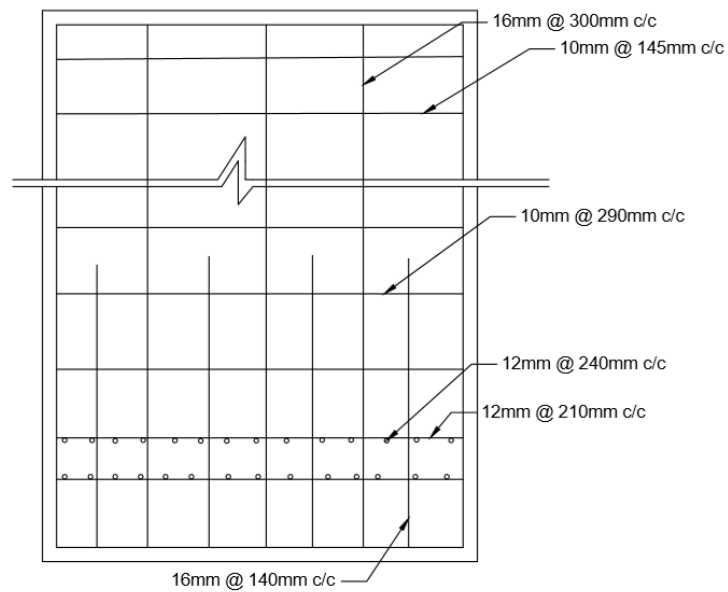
Cantilever retaining wall (Reinforcement details Longitudinal cross section)
